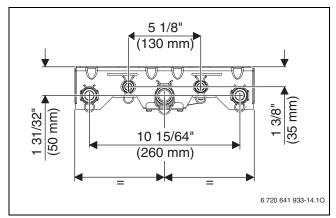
Hydraulics connection plate for combi boiler ZWB...-3A (top view)
